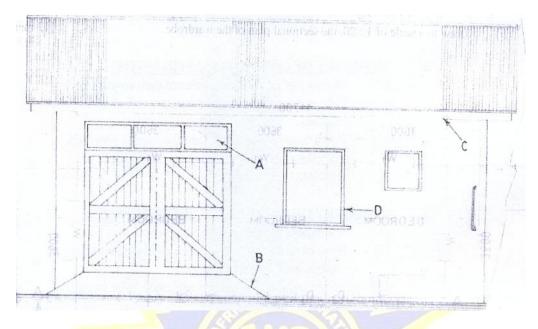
shows an elevation of a building with landcrete blocks on a made-up ground. Use it to answer the following questions:
